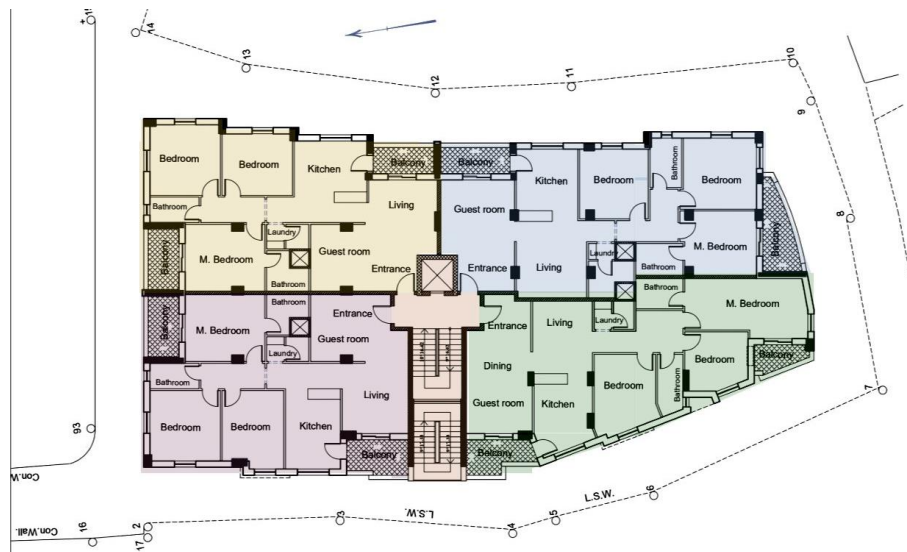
32: Repeated floor plan for residential apartments- Ein-Sara
